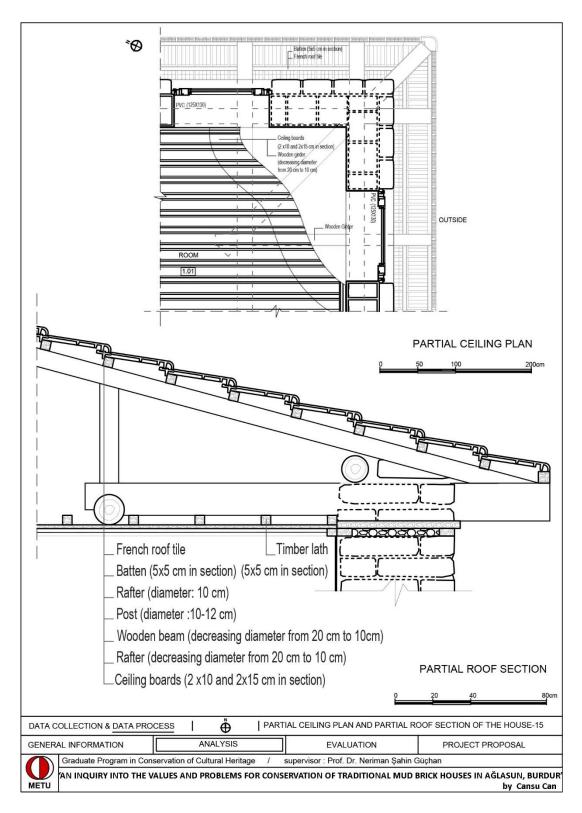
Partial Ceiling Plan & Section from the Roof Structure of the House-15.
